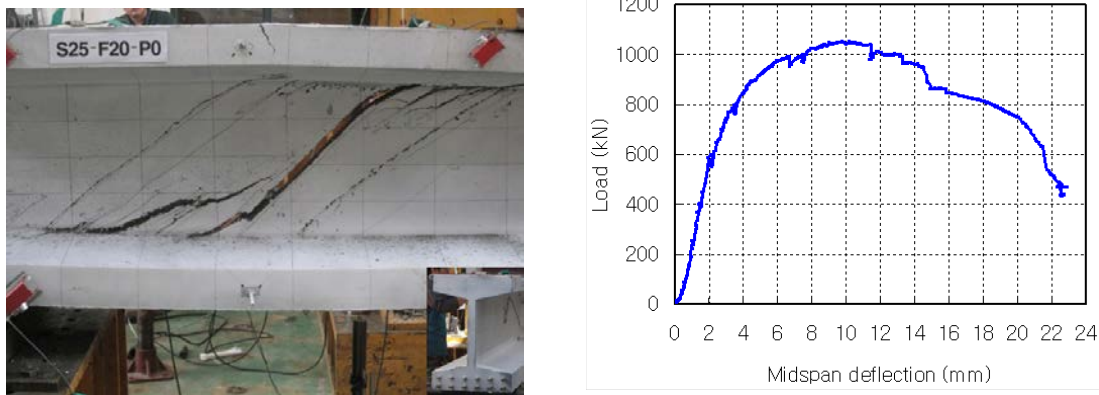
Shear test results of K-UHPC girders without stirrups (Joh C., et al., 2011)
